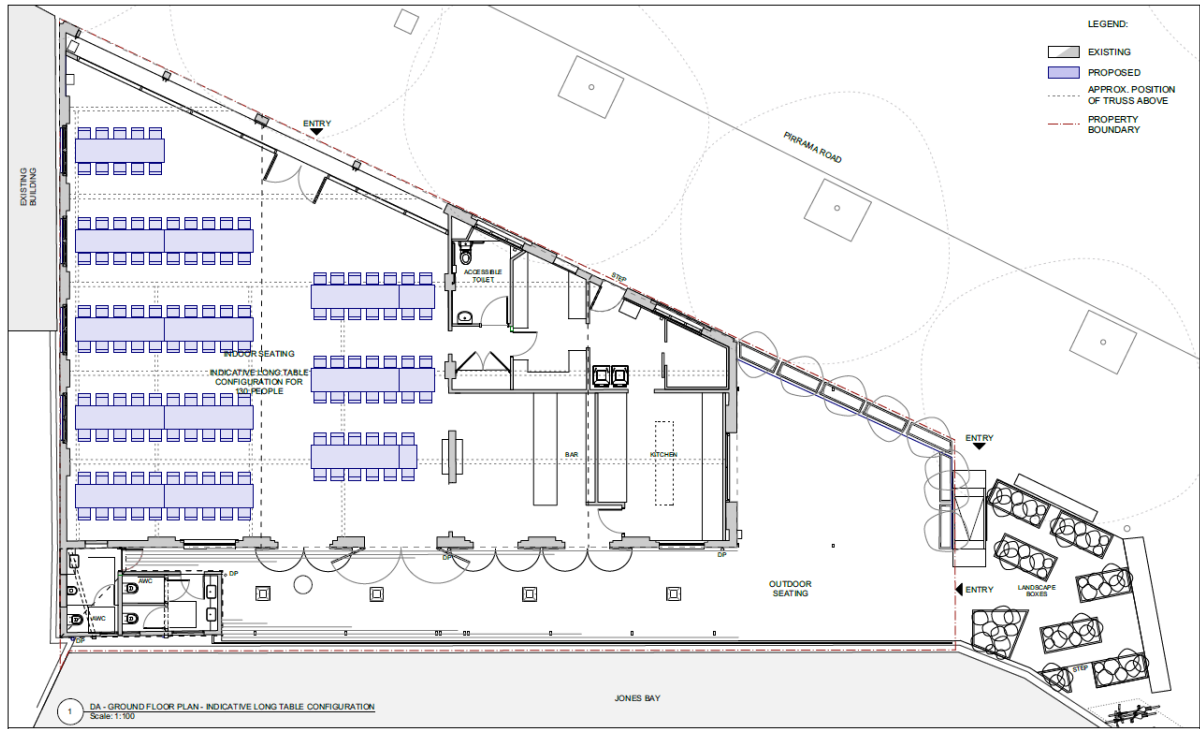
Proposed seating plan option A, noting that the configuration is for 130 instead of 110 patrons
